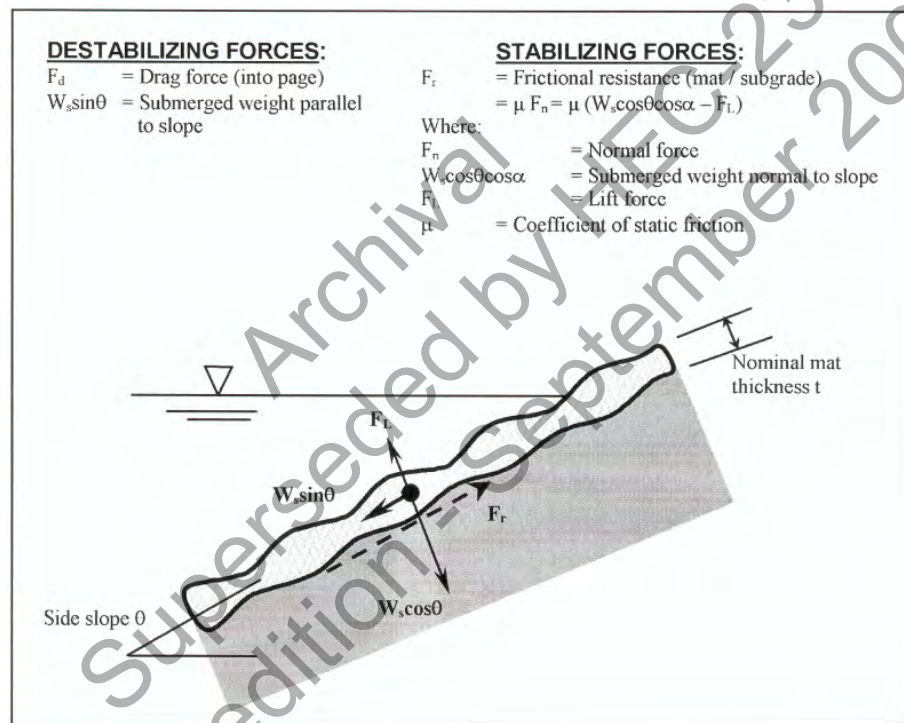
Forces acting on a grout filled mat system on a channel side slope.
